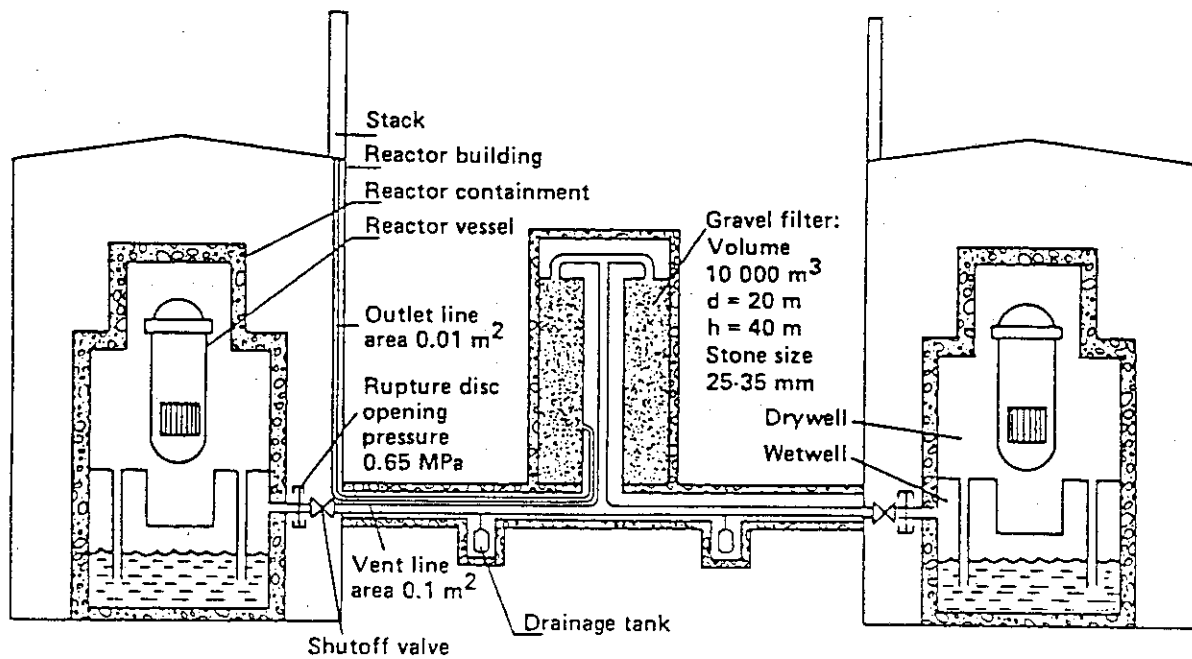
Schematic Drawing Filtered Venting of Reactor Containment (Reference (1))
